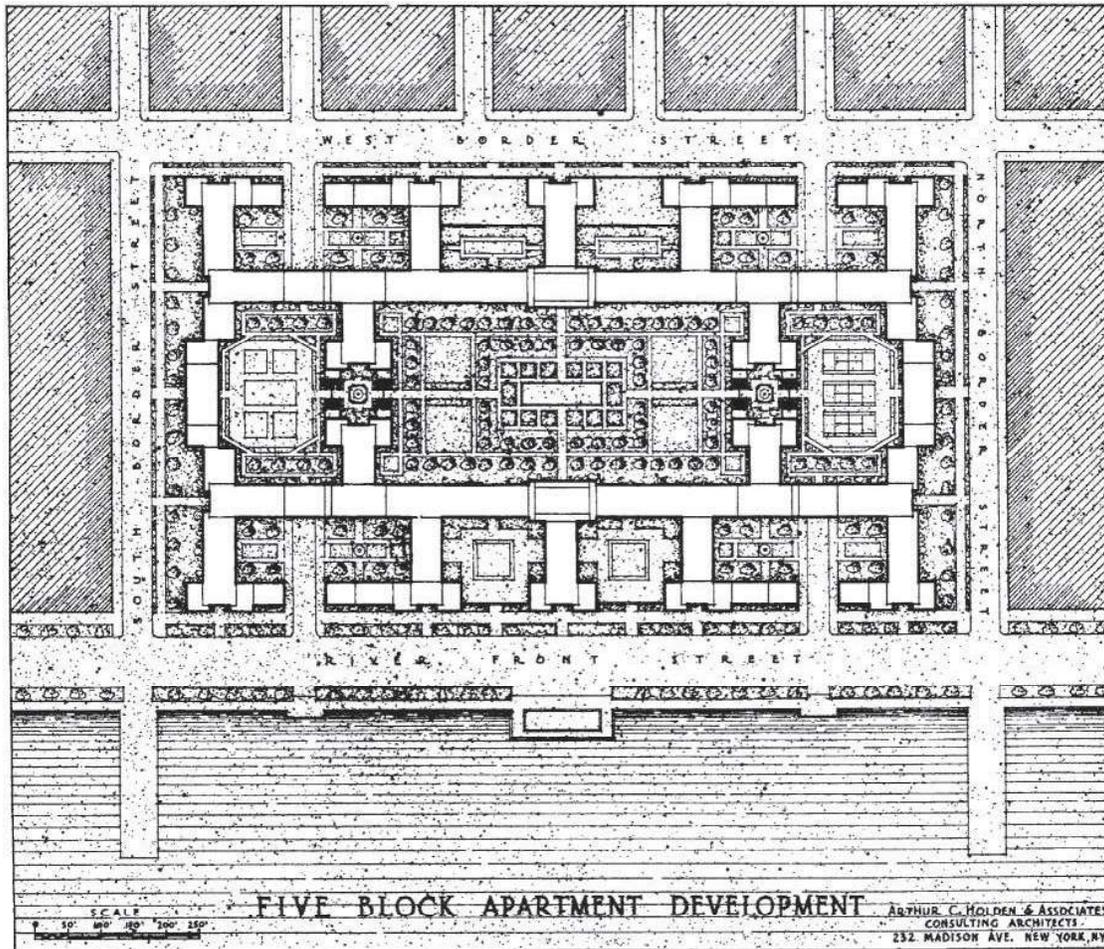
Plan illustrating a five-block apartment unit suitable for a rebuilding operation in a central section that had suffered deterioration.
